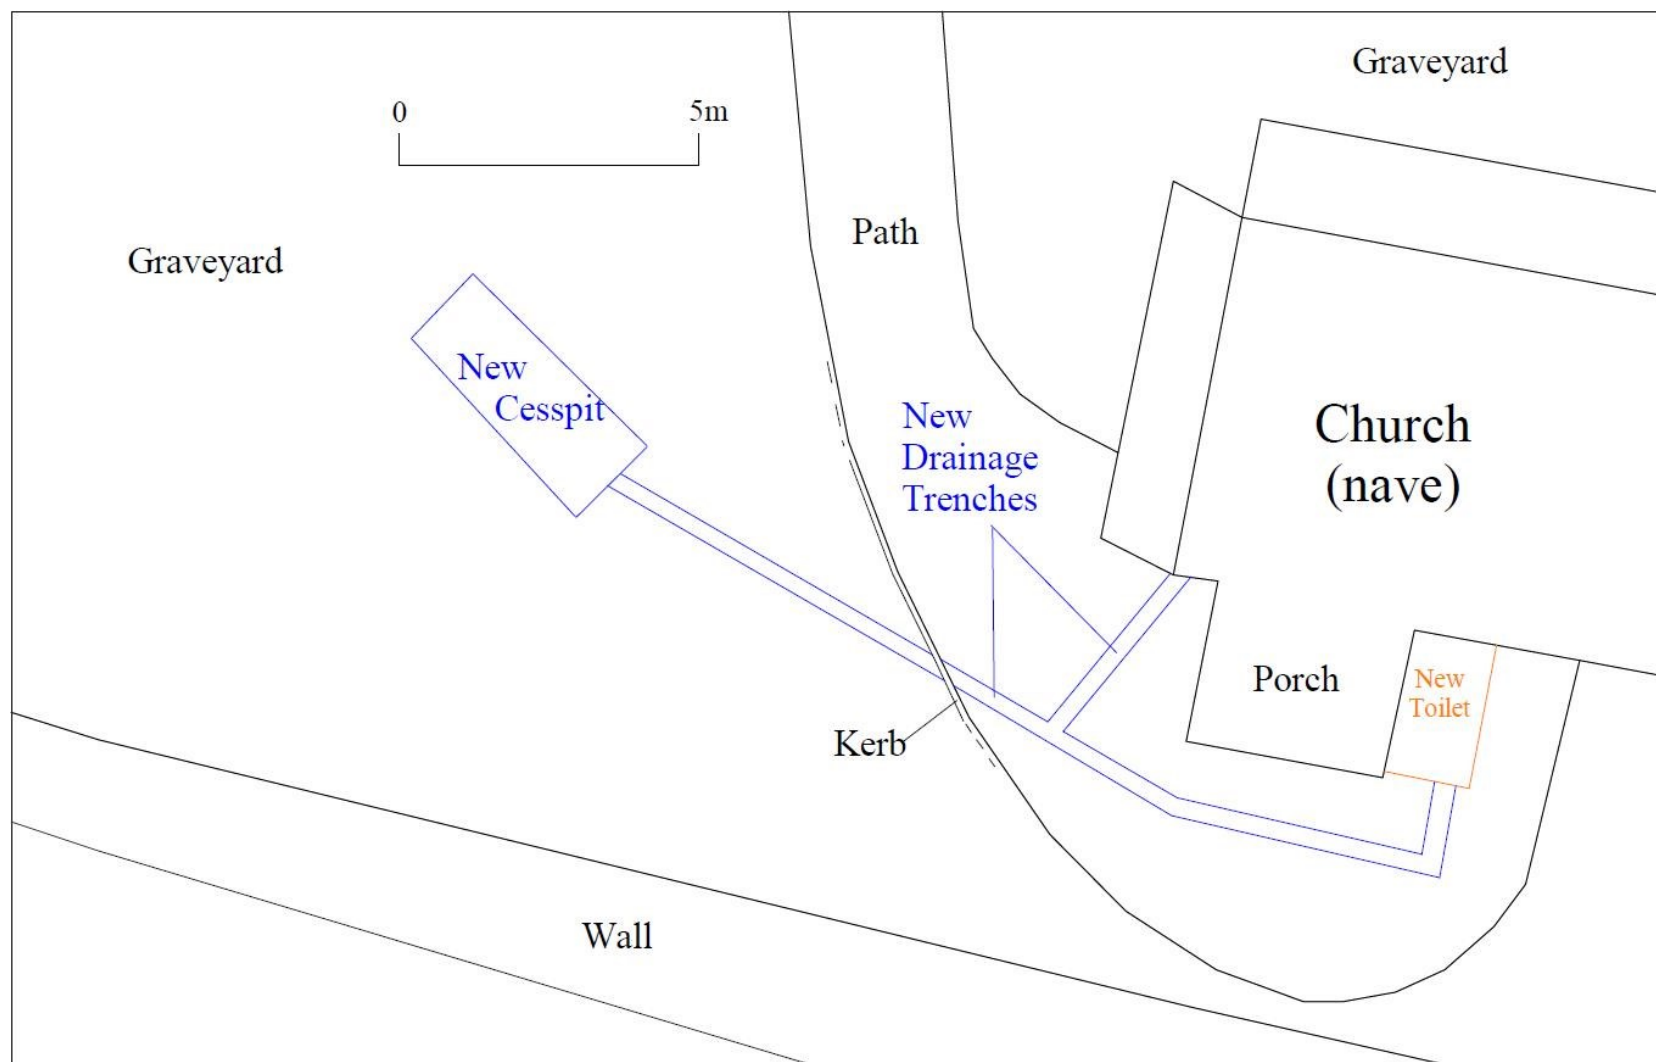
Plan of the new drainage channels and cess pit (in blue) outside St Jerome's Church
